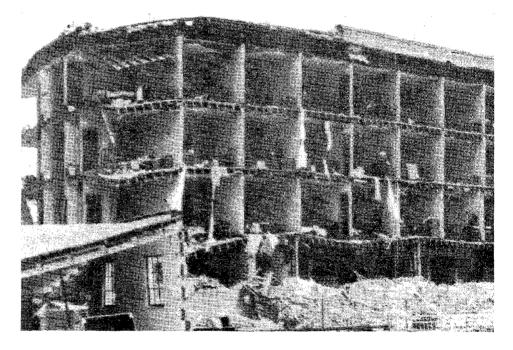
Undesigned cantilever floors at the Hotel Californian, in the 1925 Santa Barbara California earthquake.
